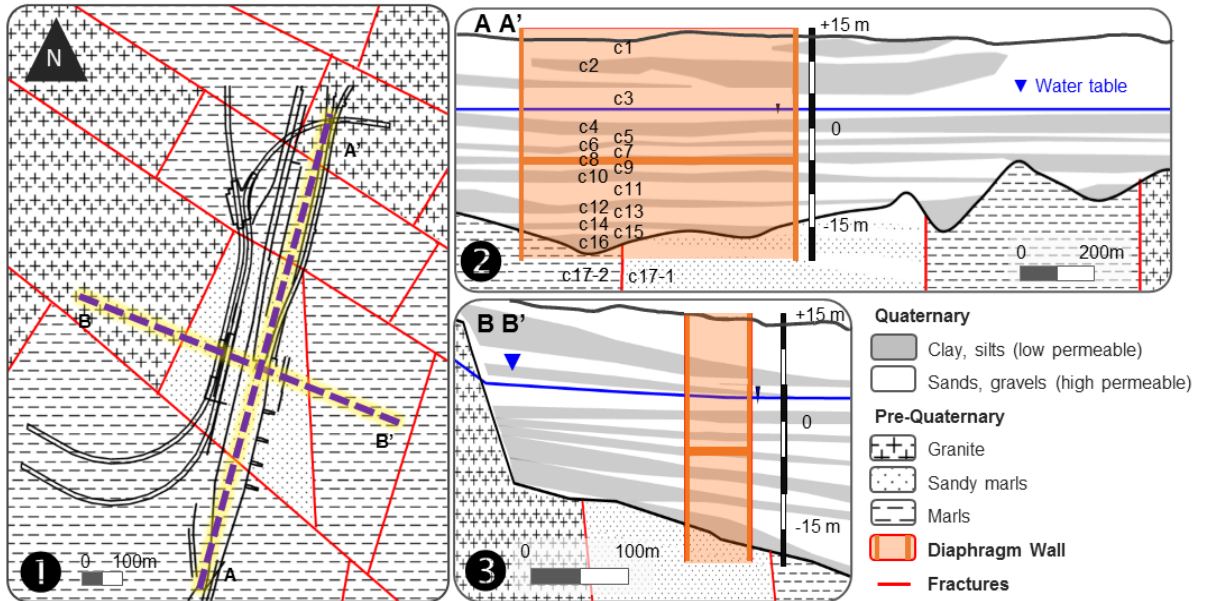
Detailed geological profile of the site. (1) Plan view of the geological basement, (2) Cross section A-B, (3) Cross section C-D. Excavation area, limited by diaphragm walls, is shown in light brown color. Both cross sections show the maximum excavation and the required dewatering system.
